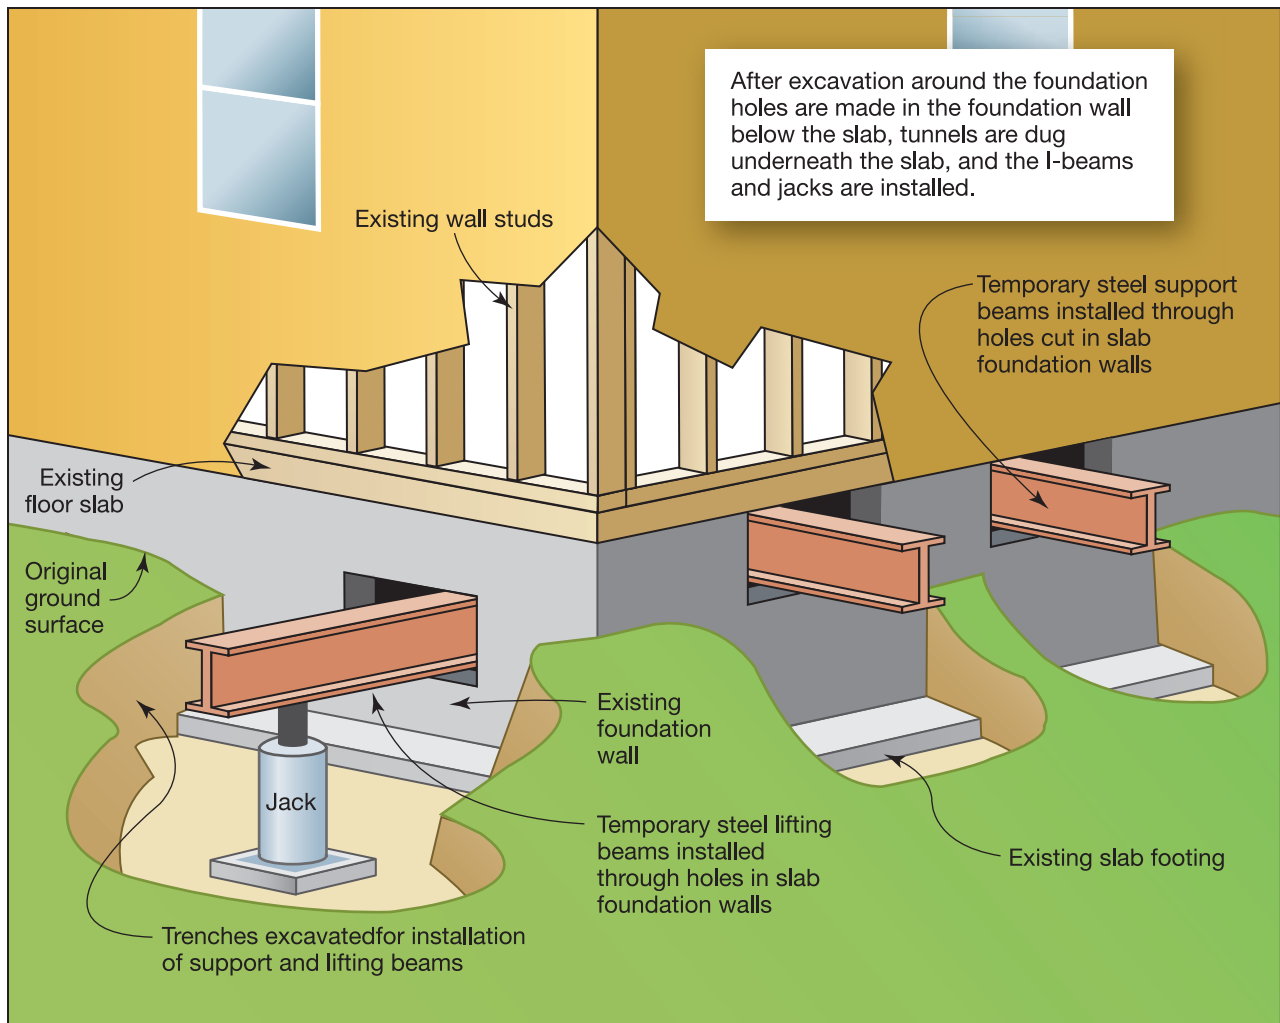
E-21. Step 1 of elevating an existing wood-frame house with stem wall foundation and the slab intact: Excavate under existing slab and install network of steel I-beams. Step 2 (not shown): Raise the wood-frame house with the slab intact, extend foundation stem walls, and install new piers.
